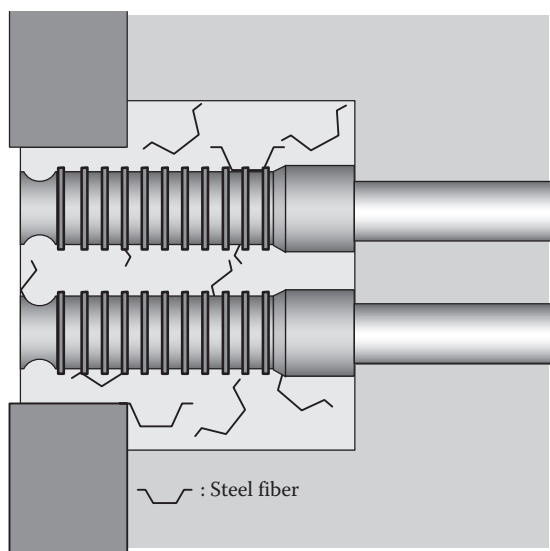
Steel fiber–reinforced concrete of a duct.
